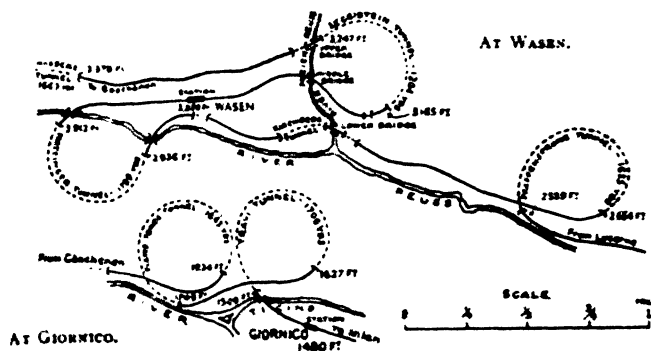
Spiral Planing on the St. Gotthard Railway.
